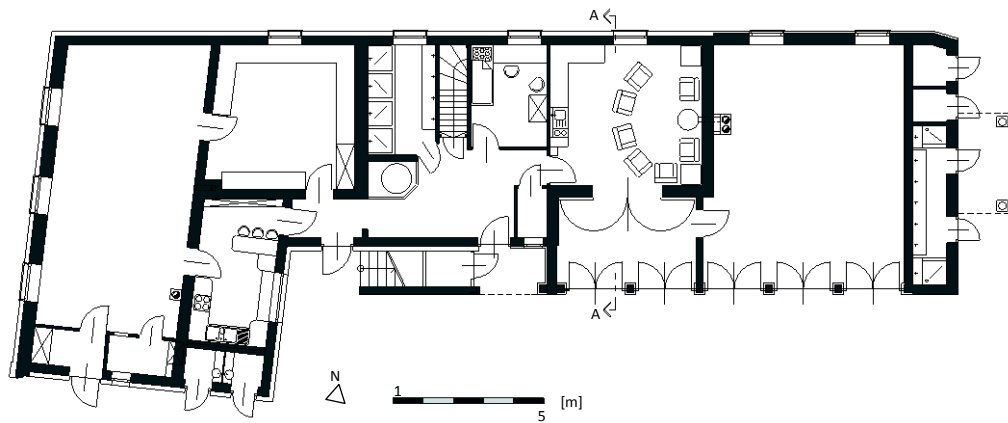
Floor plan ground floor of NAT (based on H. Deubner).
